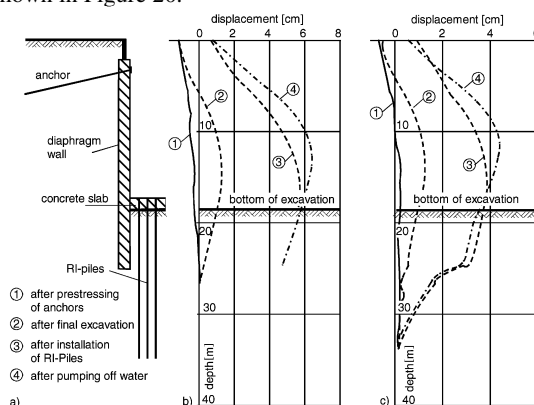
Debris-excavation at Potsdamer Platz: a) cross section of excavation b) displacements in cross section MV 1 c) displacements in cross section MV 2 (Hettler and Triantafyllidis)
